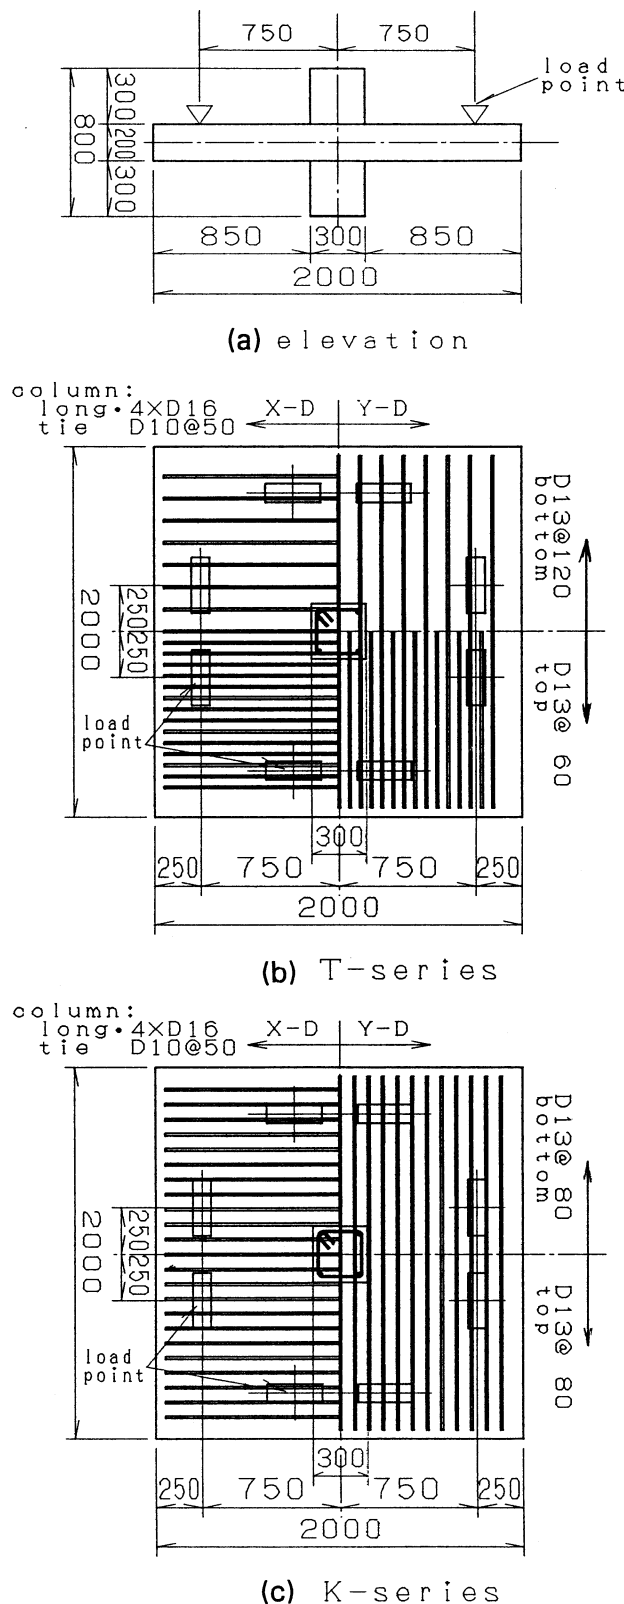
Specimen geometry and arrangement of longitudinal reinforcement (dimensions in mm; 1 mm = 0.039 in.)
